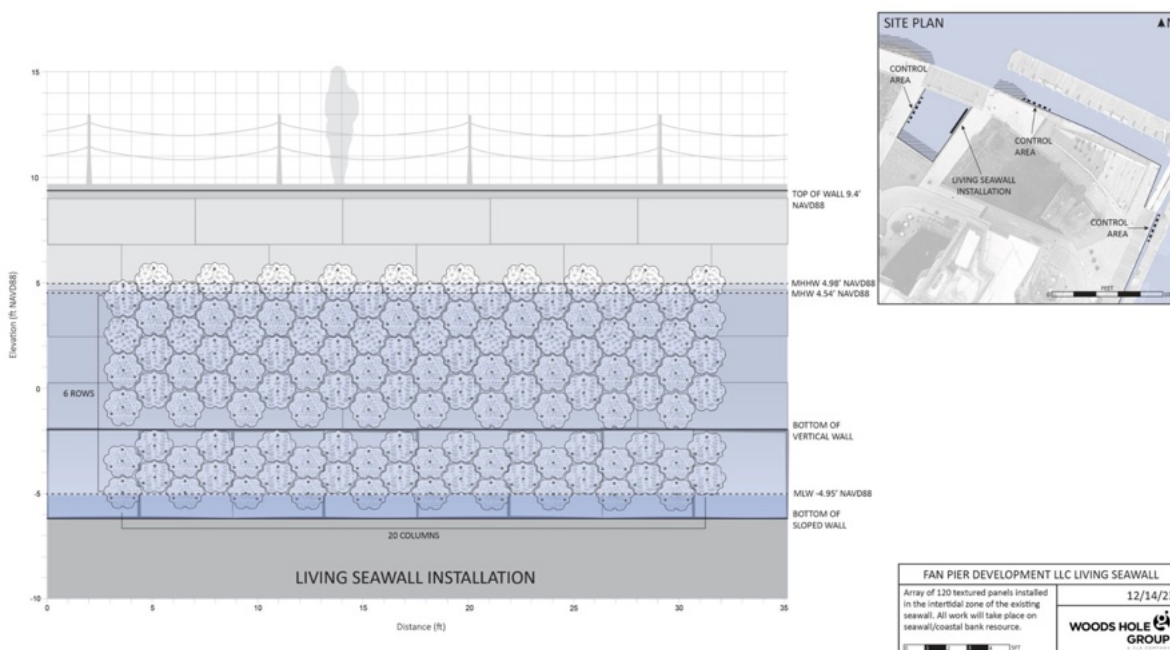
Engineering design plan for the Living Seawalls installation at Fan Pier, Seaport.
